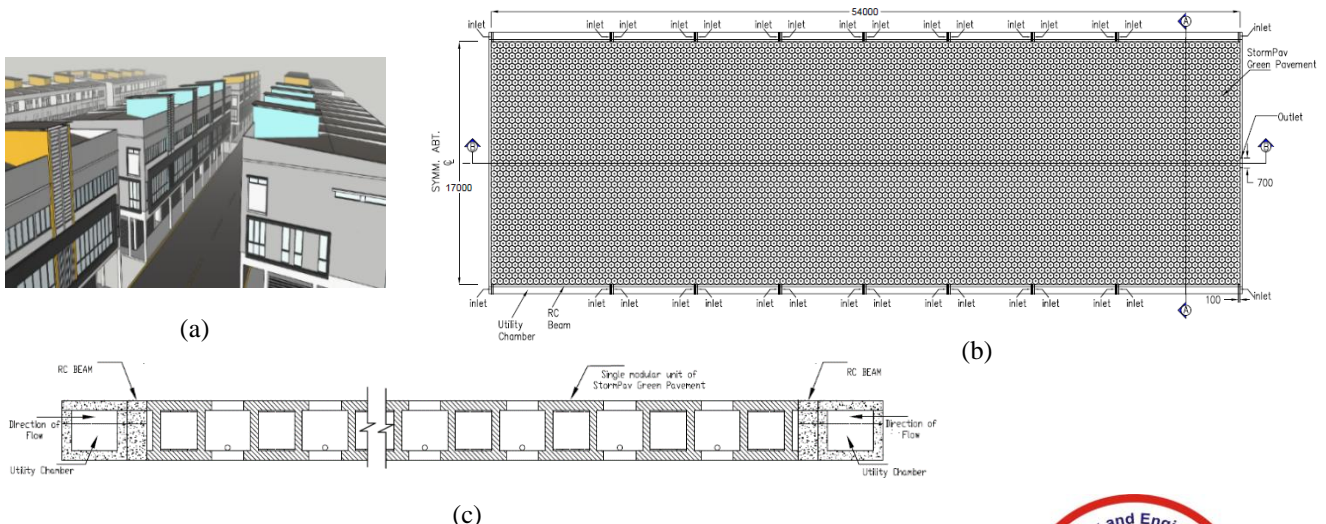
Study Area, (a) Typical Commercial Premises, (b) Plan View and (c) Long Section View of StormPav Green Pavement System
